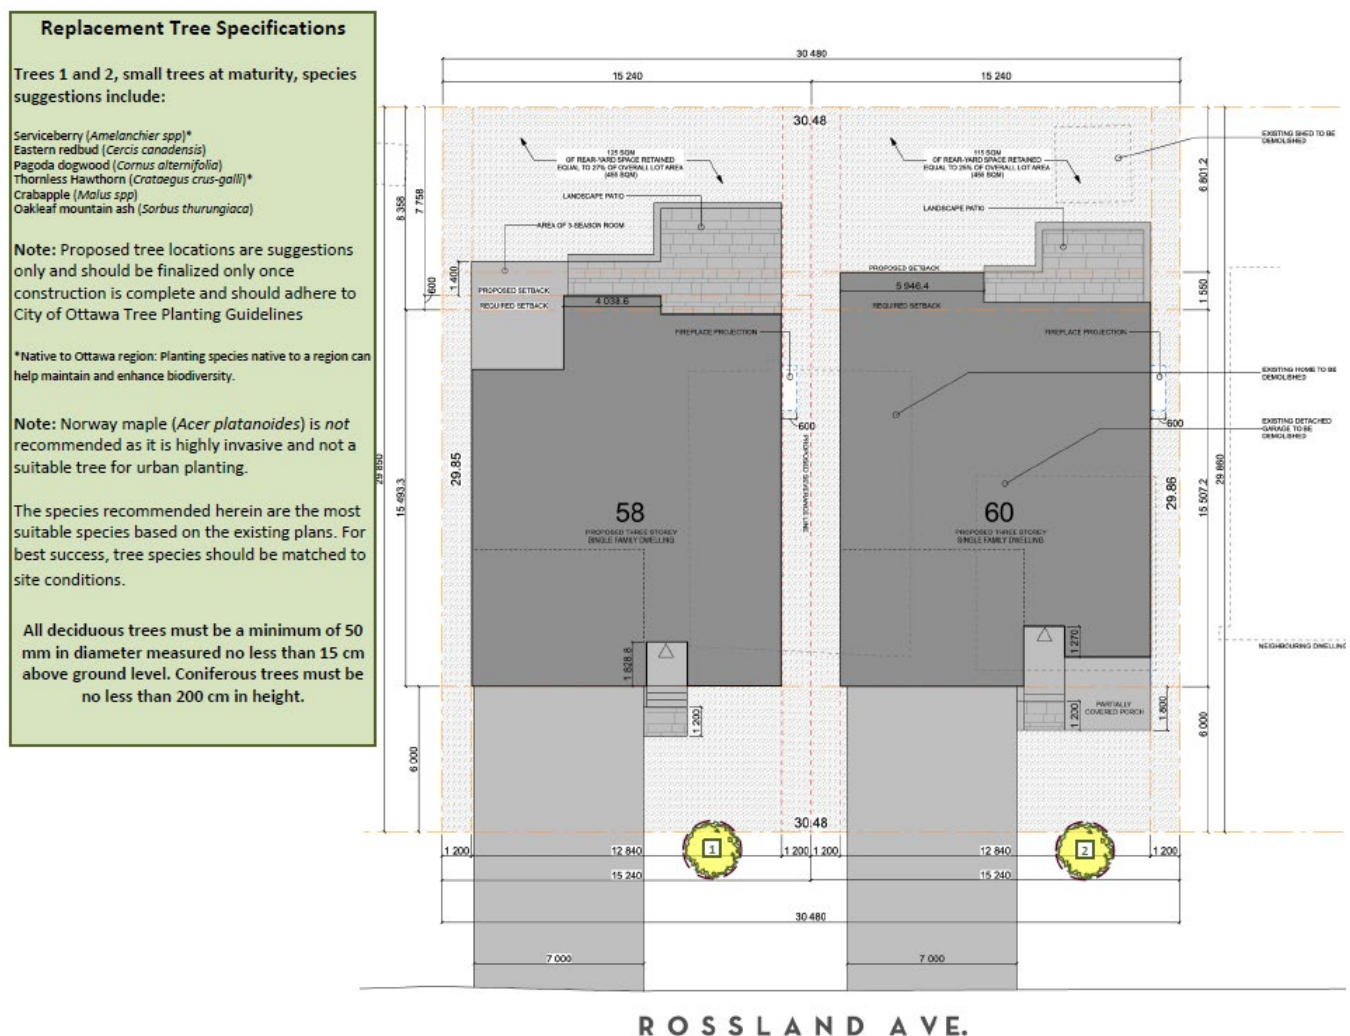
Tree Planting Plan for 58 and 60 Rossland Avenue
